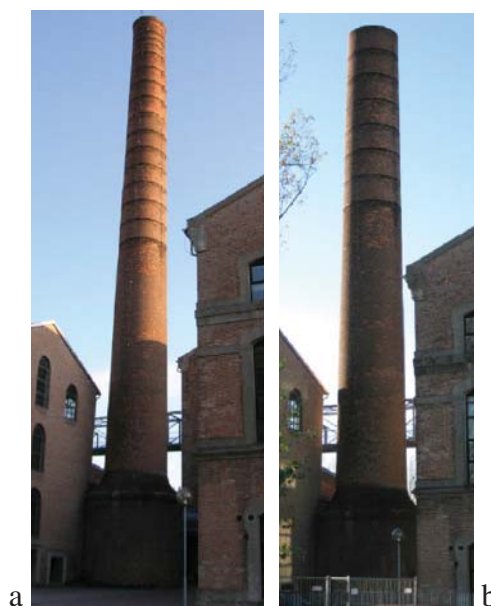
Masonry chimney in Ferrara before (a) and after (b) shortening [5].
